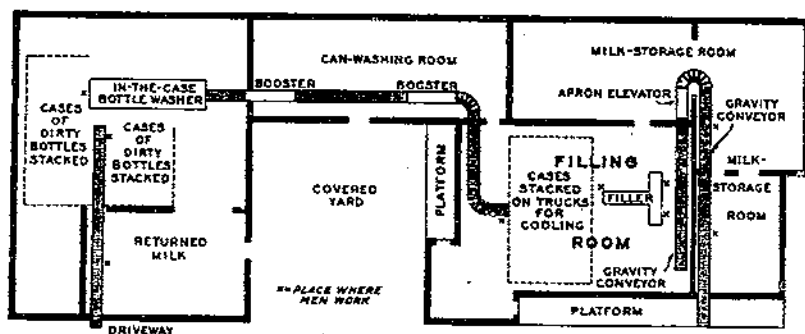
Floor plan of an old, poorly arranged milk plant which had been enlarged one or more times
